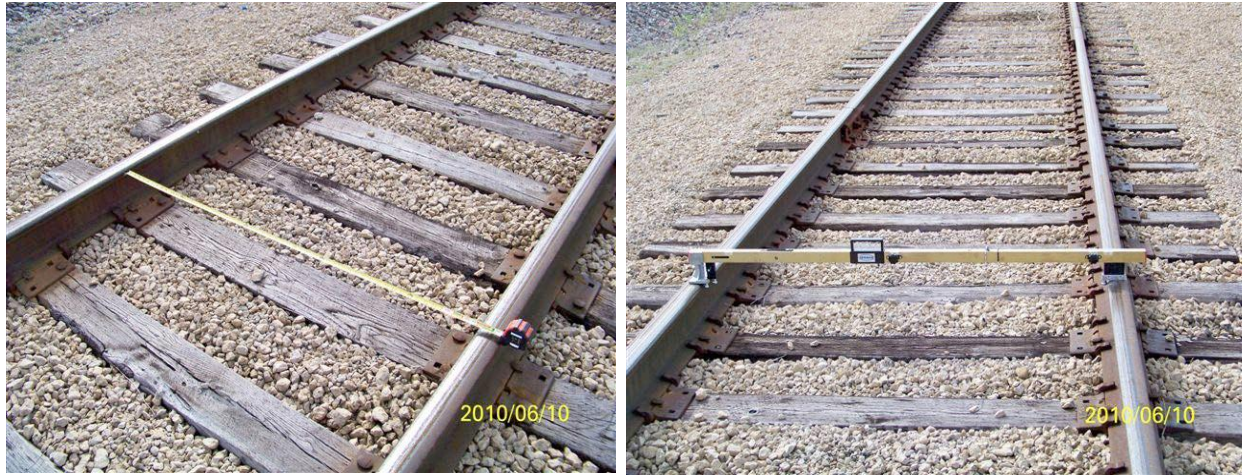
Measuring gauge with a standard tape and gauge measurer (CN 2014)
